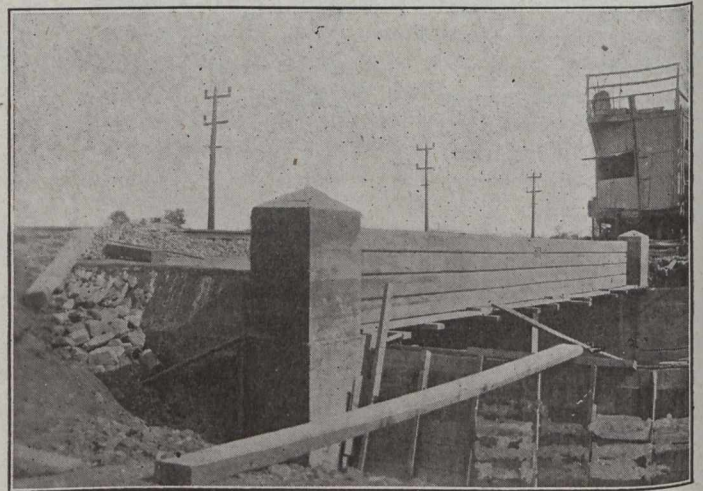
Southwest Corner of Bridge, Showing Waterproofing.
